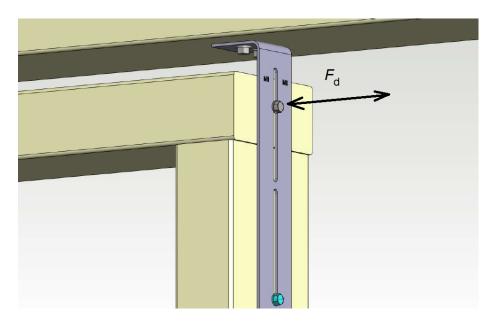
Typical use of Sliding Partition Bracket and loading directions
